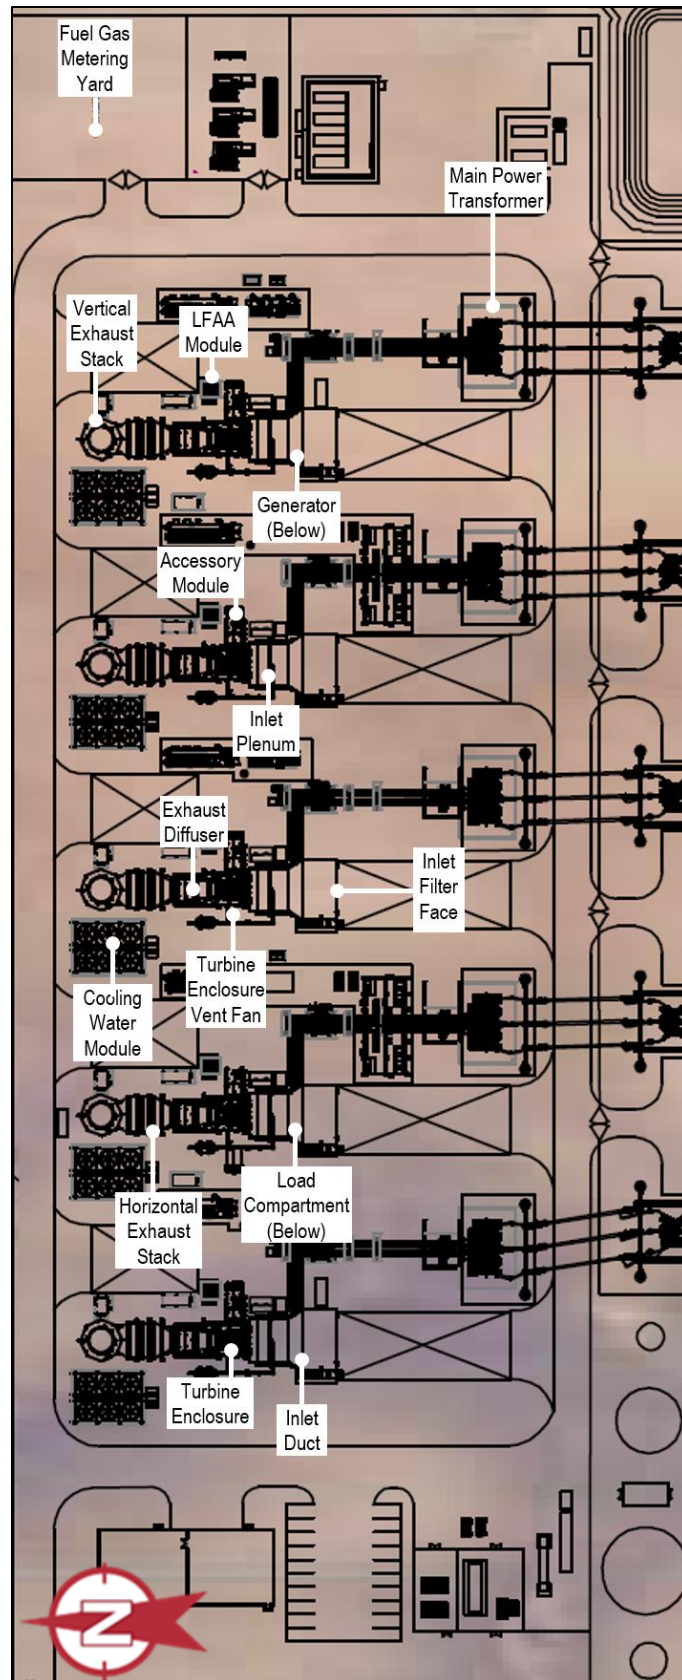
Alternative Site Plan and Noise-Producing Equipment
